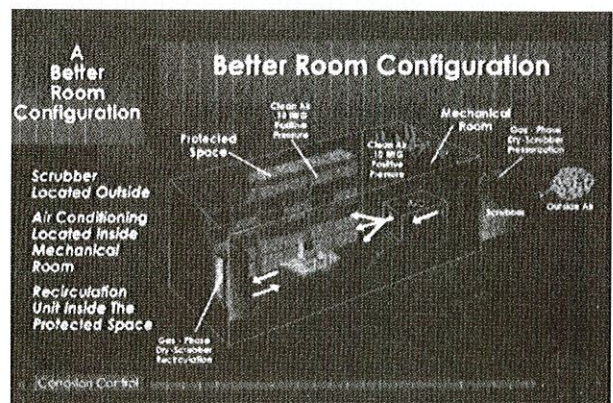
Control room layout, using pressurization only, with air-handling equipment inside adjoining pressurized equipment area.
